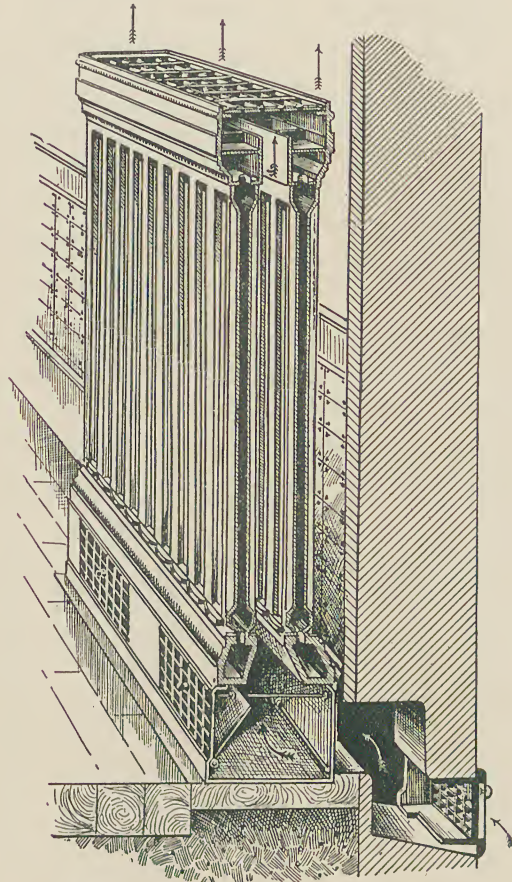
Sectional View of Rosser & Russell's Ventilating Radiator.
